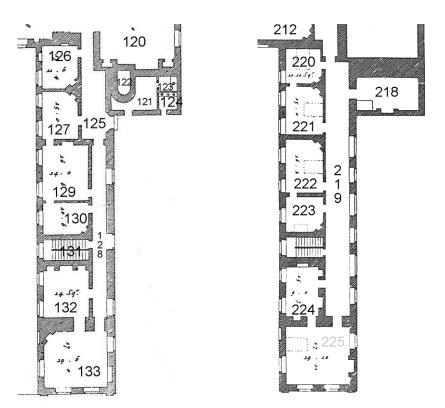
The first and second floor from Colen Campbell's plan published in 1717.
